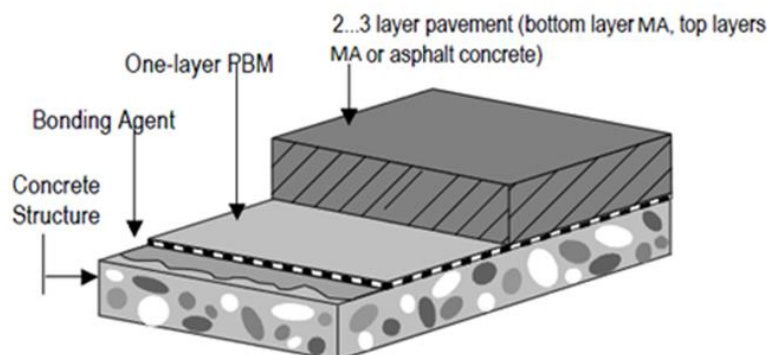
Scheme of a concrete bridge deck waterproofing system [1].
